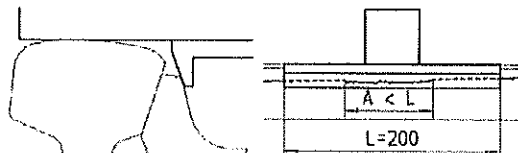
Templates "2T" und "2L" – Application for switch breakouts
